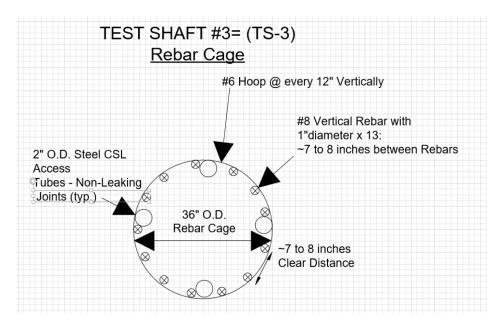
Illustration. Initial design cross section of test drilled shaft #3 with reinforcement detail.
